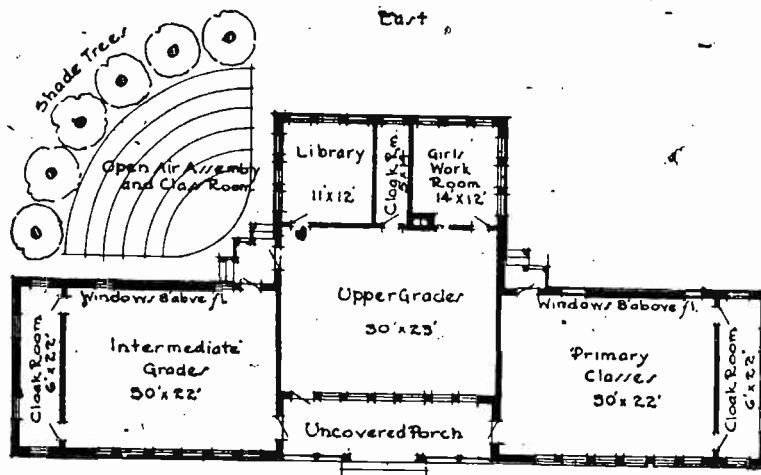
Floor plan, three-teacher consolidated rural school with open-air assembly and class room.
